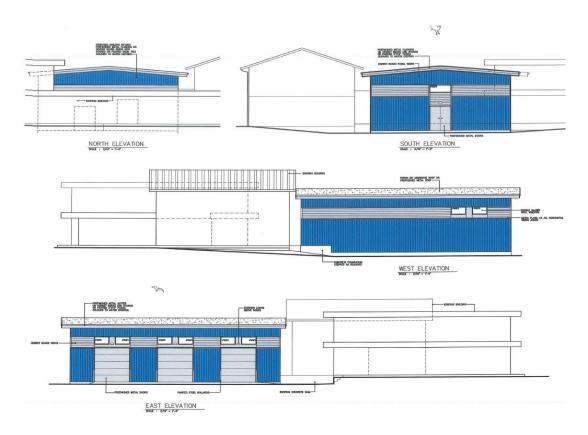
Elevations of the proposed building at 1045 Gibsons Way
